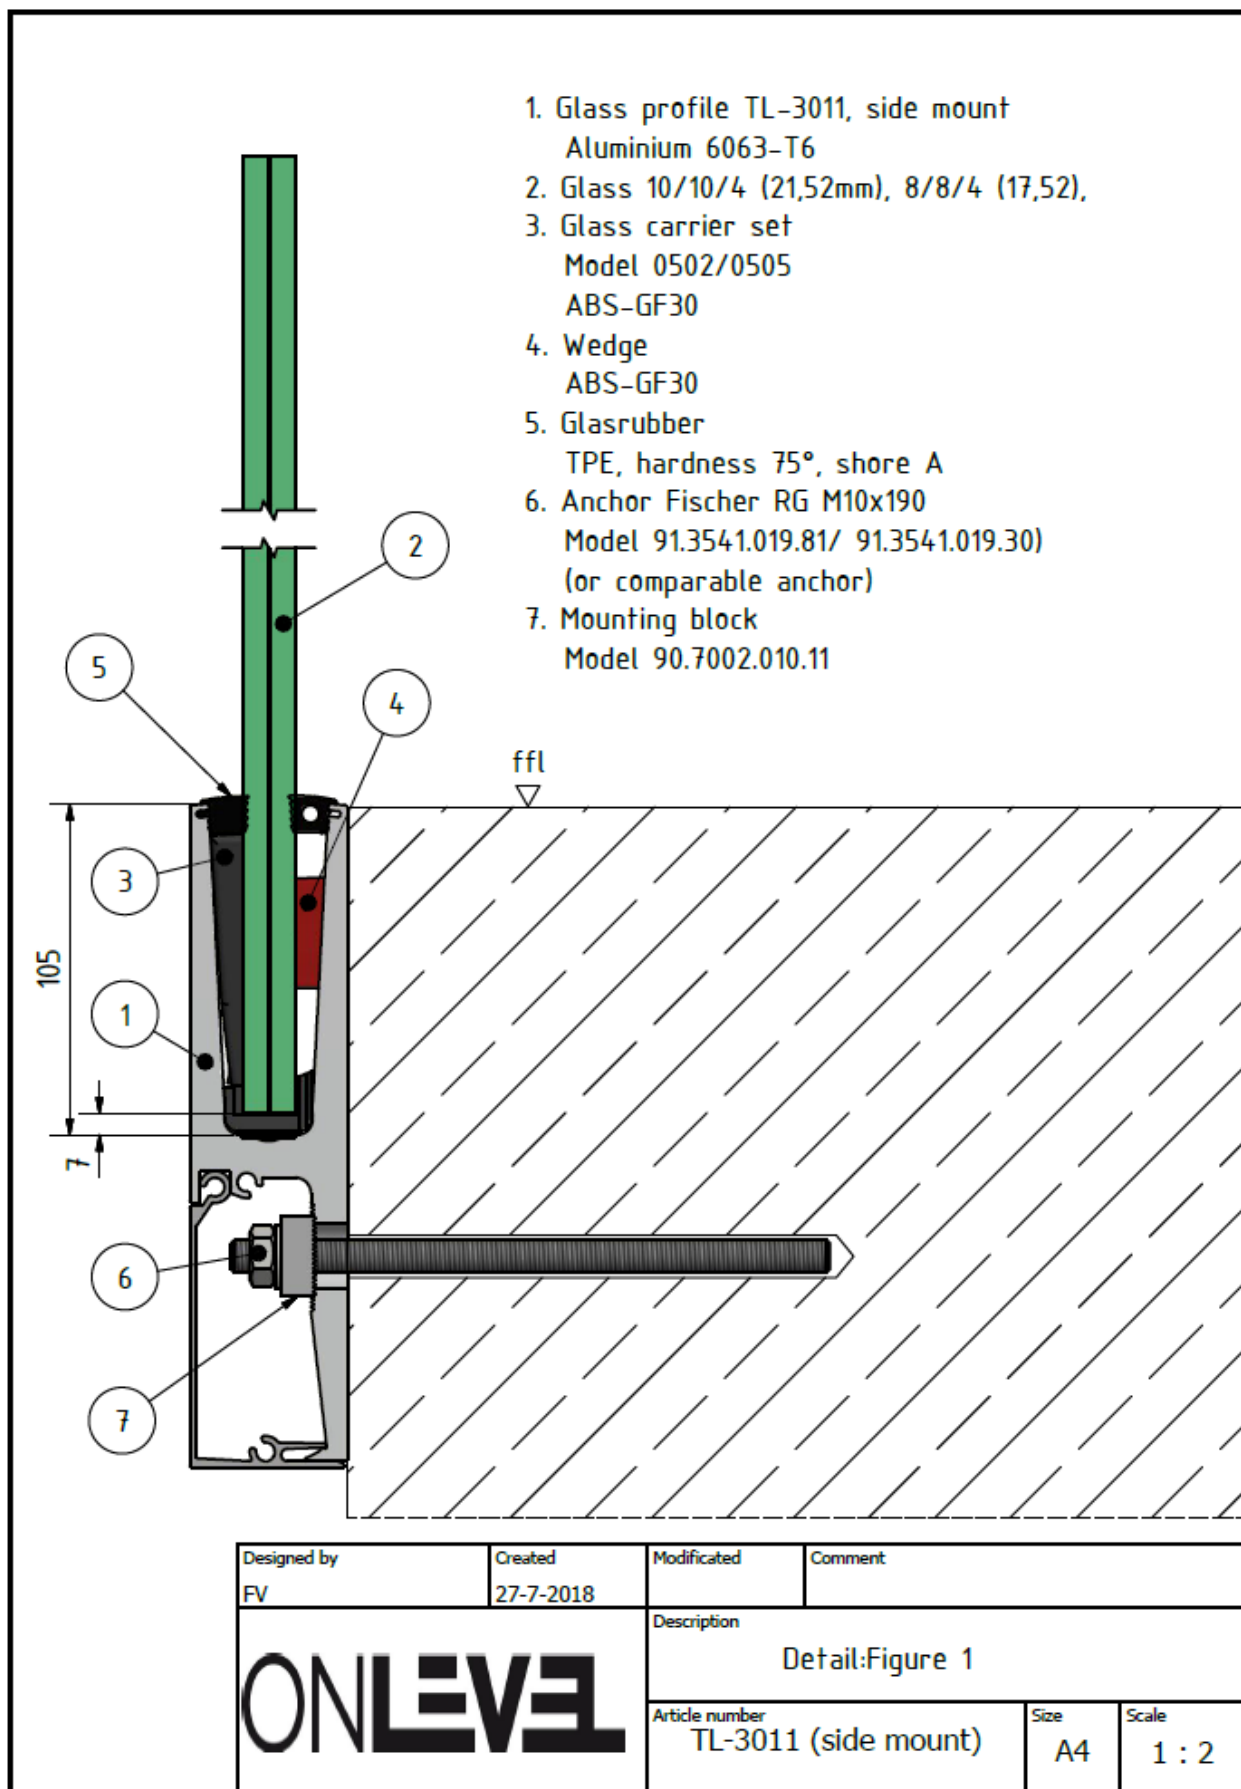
13. Product drawing from OnLevel for profile 3011 Side Mount – 1.0 kN/m, sheet 1 of 4.
